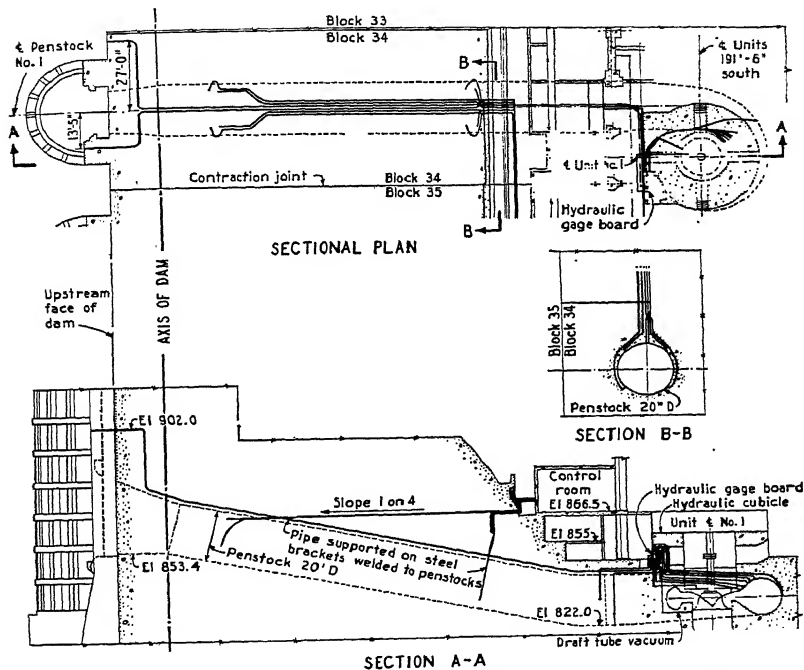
Section view of the dam through unit No. 1 penstock, showing location of piezometers and recording devices.
